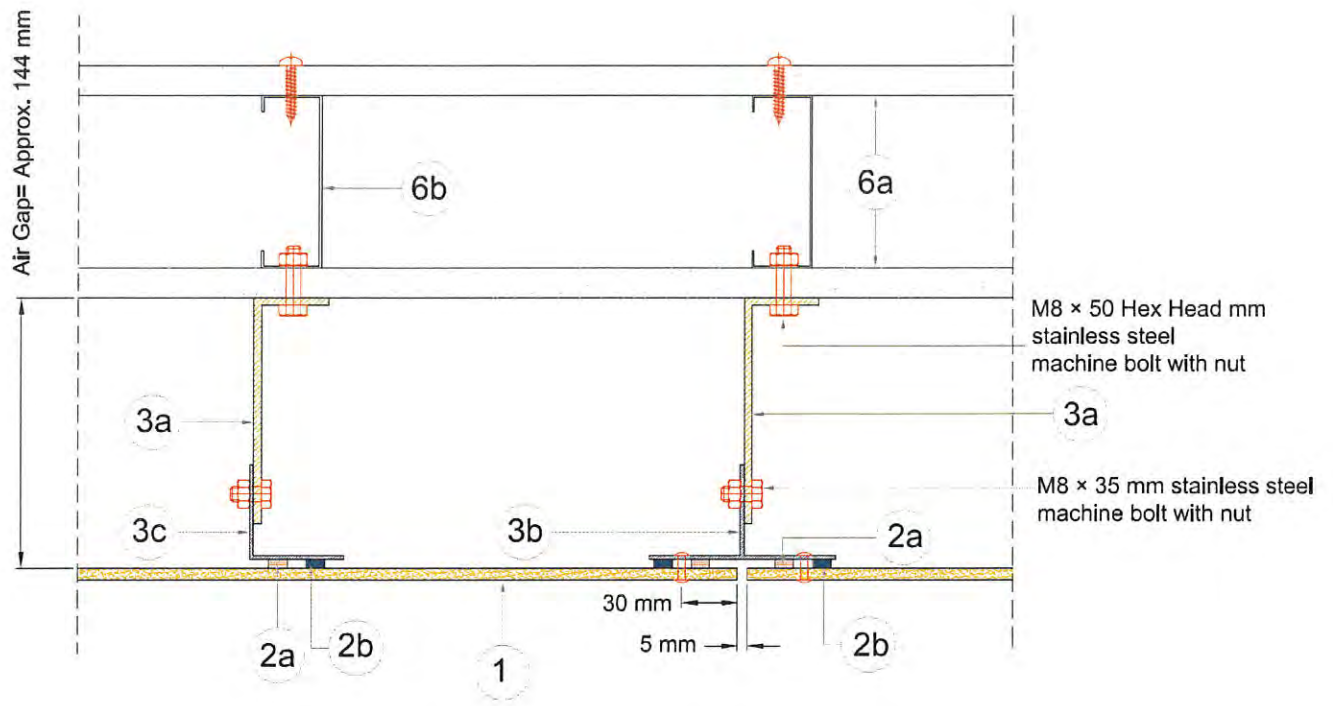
Non-load-bearing exterior wall cladding assembly typical horizontal section details
